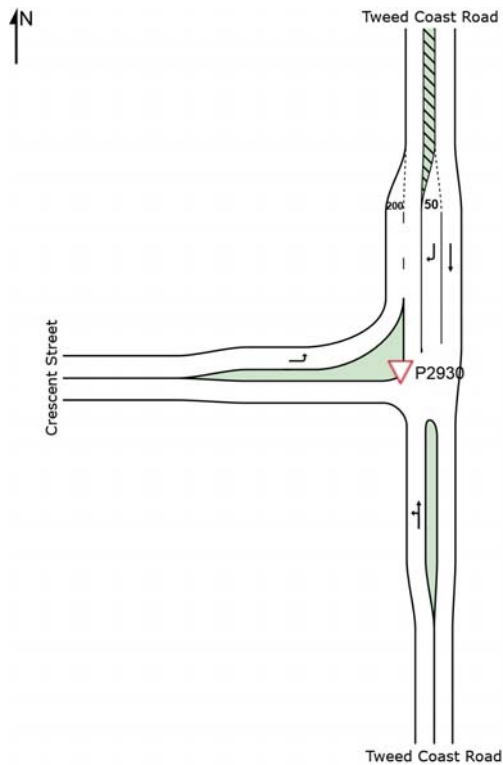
Tweed Coast Road / Crescent Street Intersection Layout
